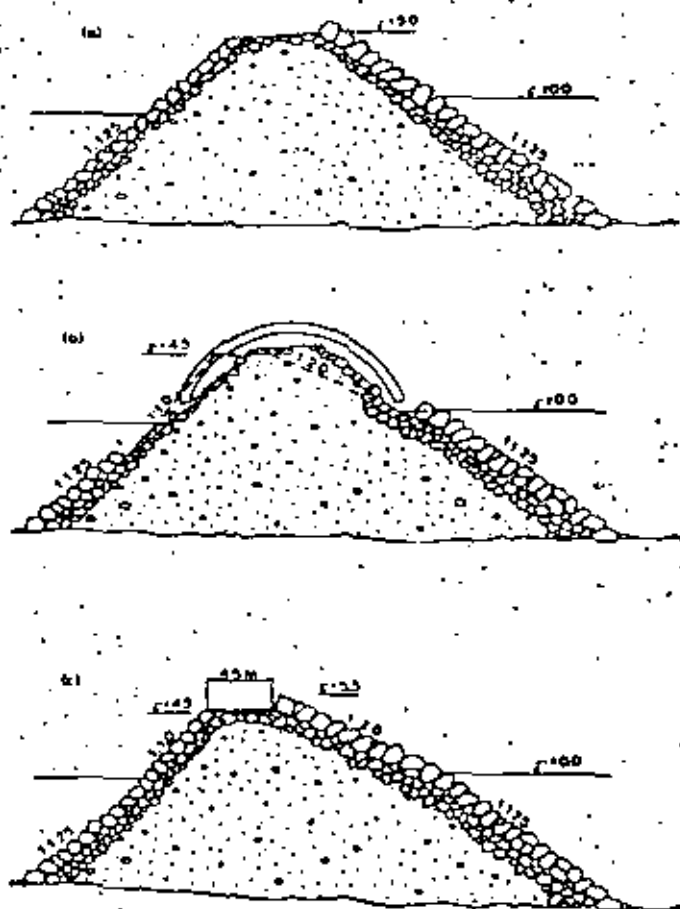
A. Breakwater after first season of construction. Both slopes with natural angle (1:1.25). The jetty has an extra height of 0.5 m (Gryllefjord, Troms).
